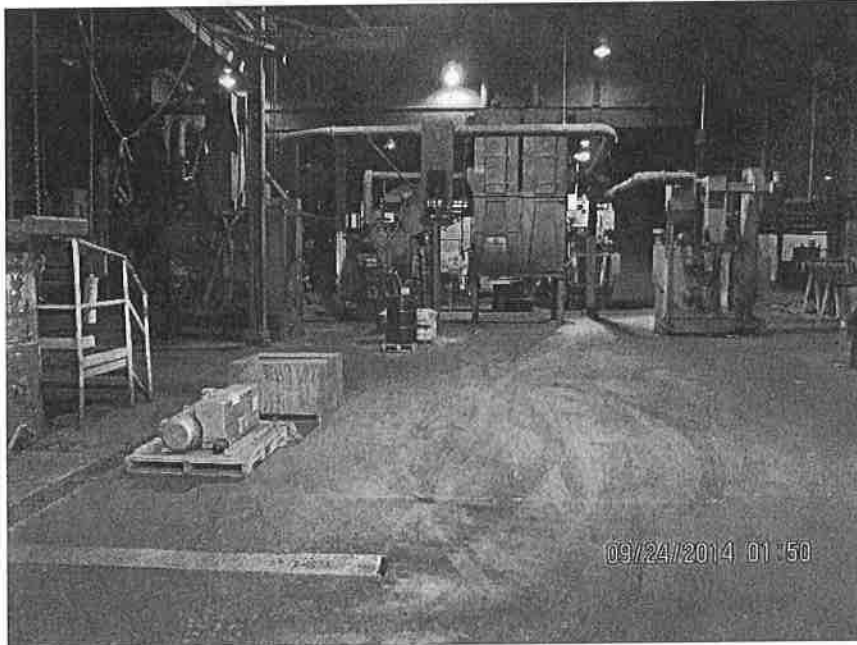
Typical building floor slab in south building. View to west; photograph taken on September 24, 2014.
